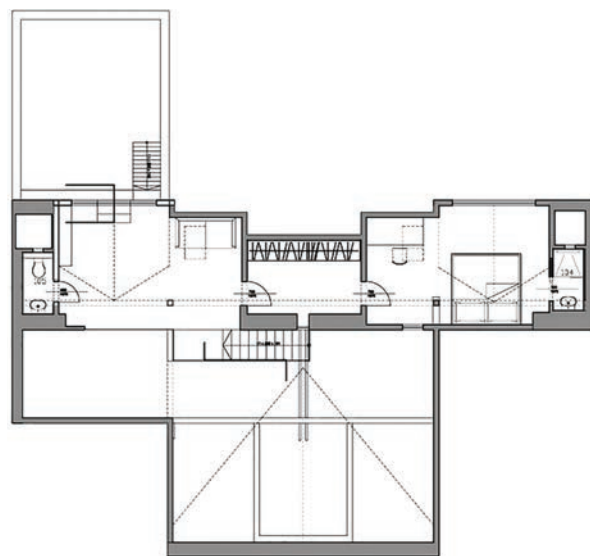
Attic Loft Reconstruction, Prague, B² Architecture, 2013 (Source: www.archdaily.com)
